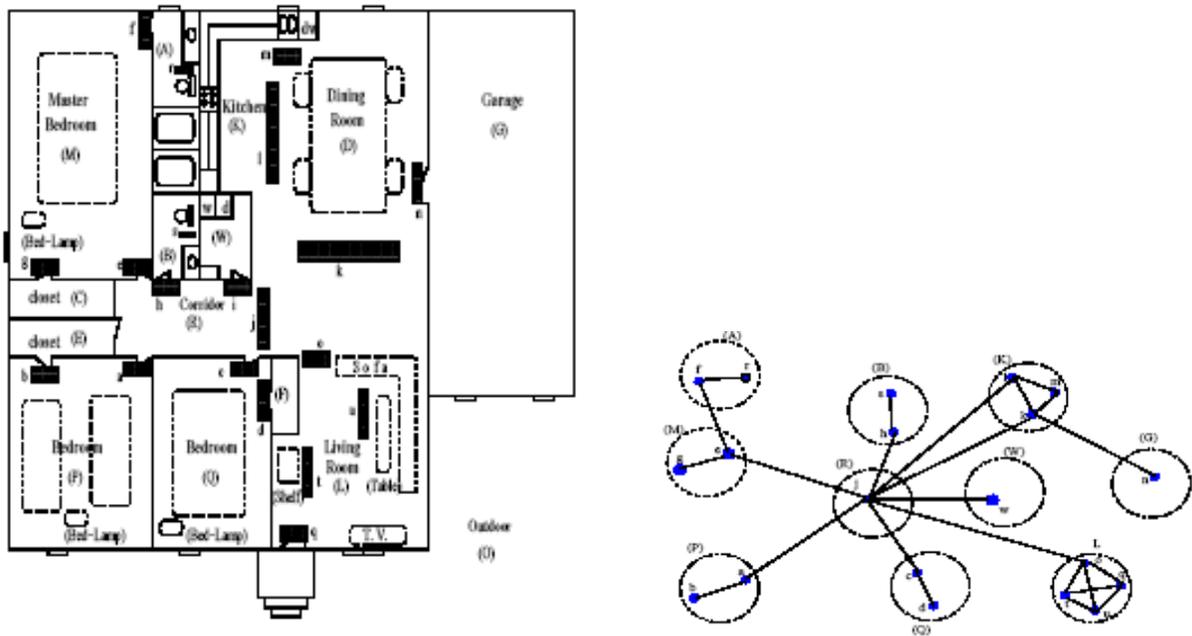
(a) Typical floor plan of MavHome architecture, (b) Graph representing connectivity of sensor zones
